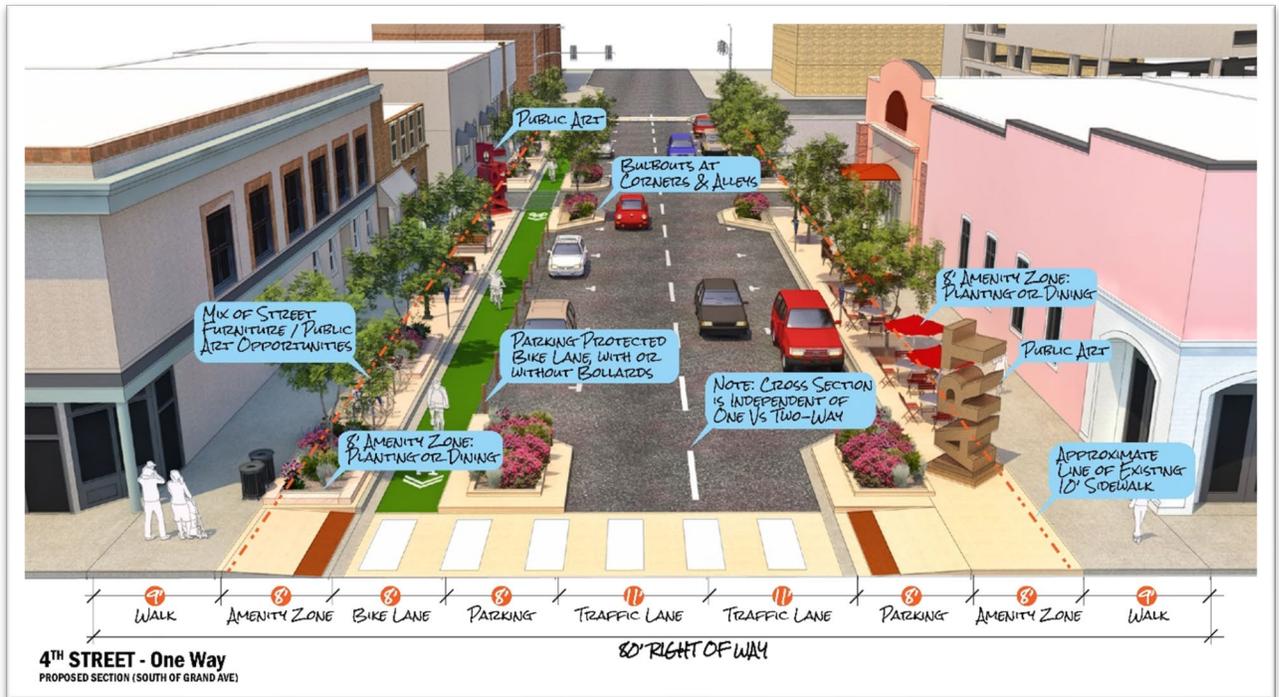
Proposed Section - One-Way - 4th St South of Grand Ave
